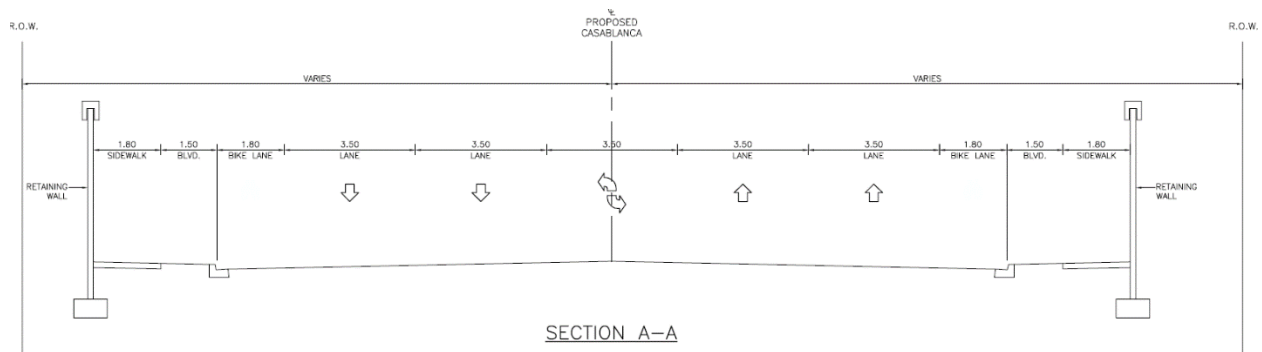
Cross Section of Casablanca Boulevard at the Future CN Rail Crossing
